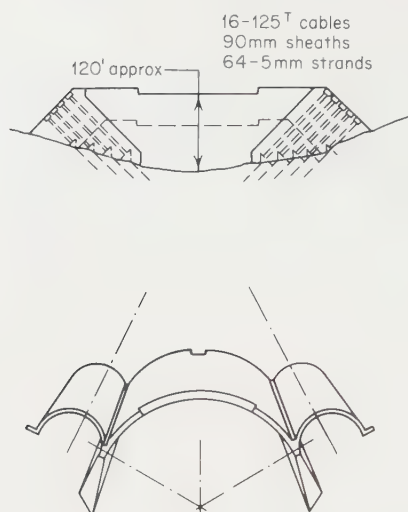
Mont Larron Dam, France, 1958. Use of cable prestressing in multiple-arch dam.
